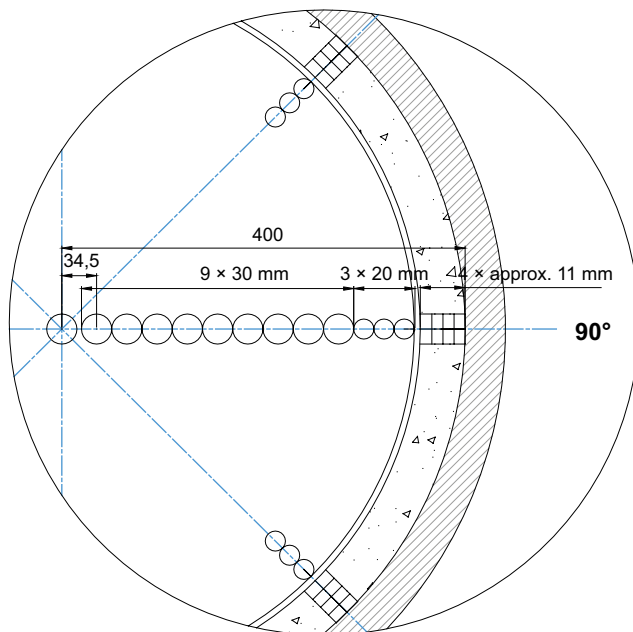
BB IV. Close-up of a cross section profile showing the sampling plan.
